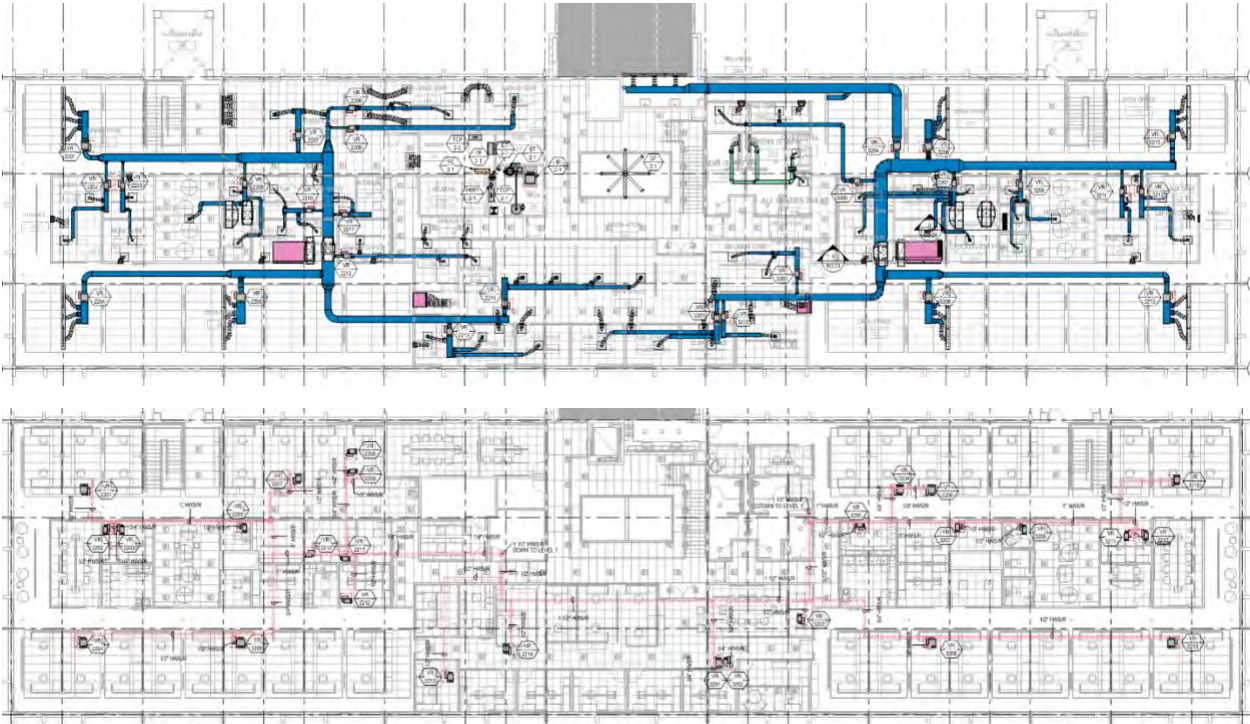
2nd Floor of 2-Story, 40,000 ft² Medium Office Building
